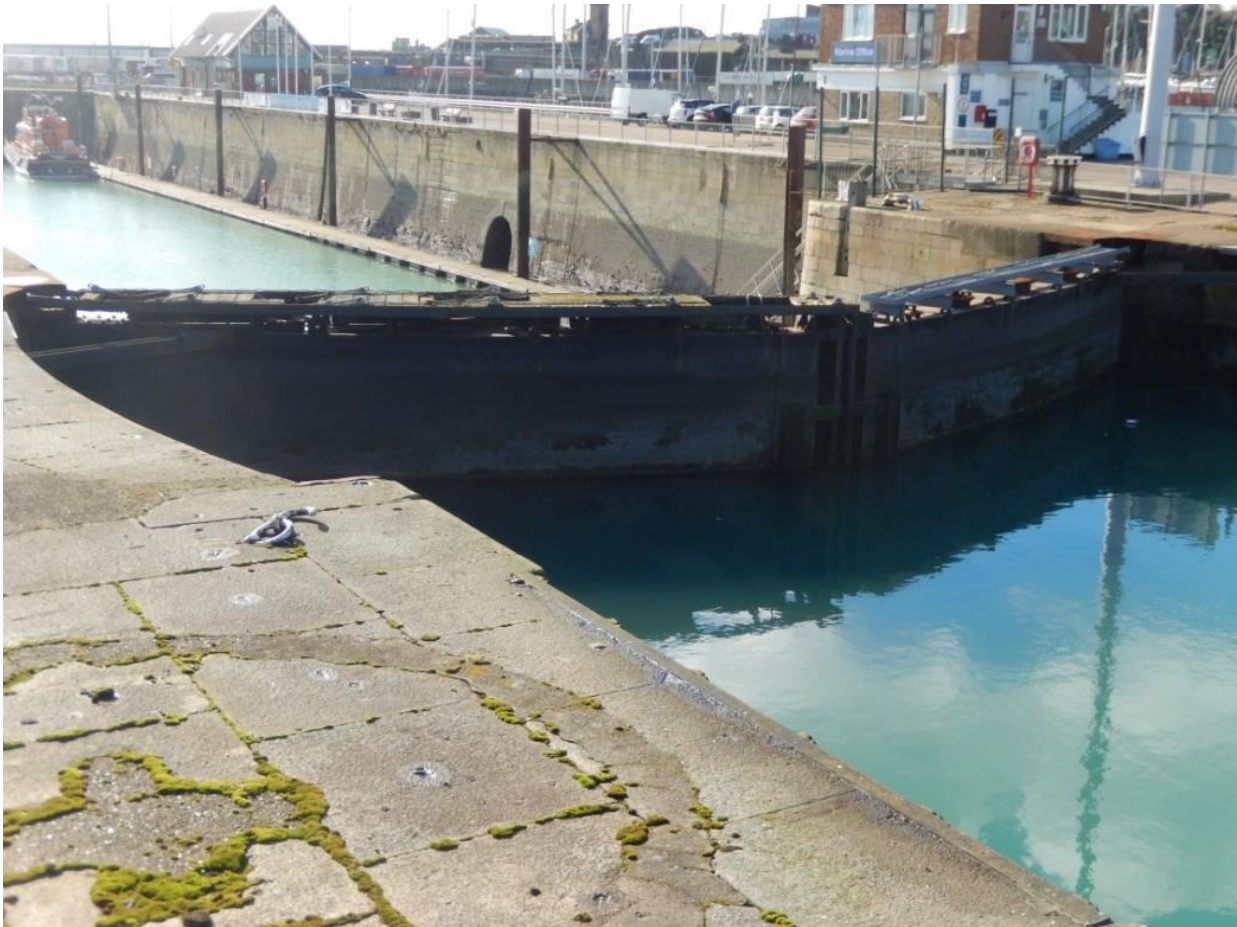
View of the Wellington Dock Gates, looking south, 25/01/2016, DHB.
